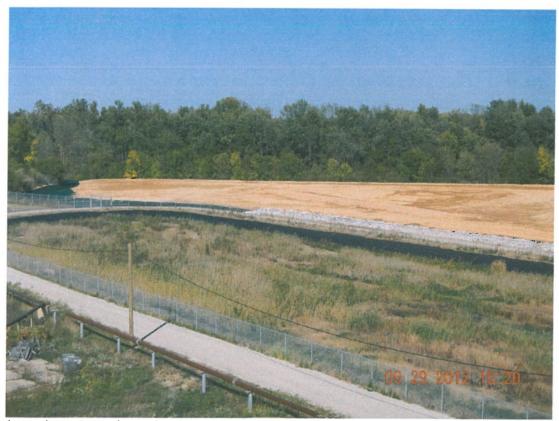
A - Anchoring flexible hose for temporary discharge into bottom ash pond facing east
